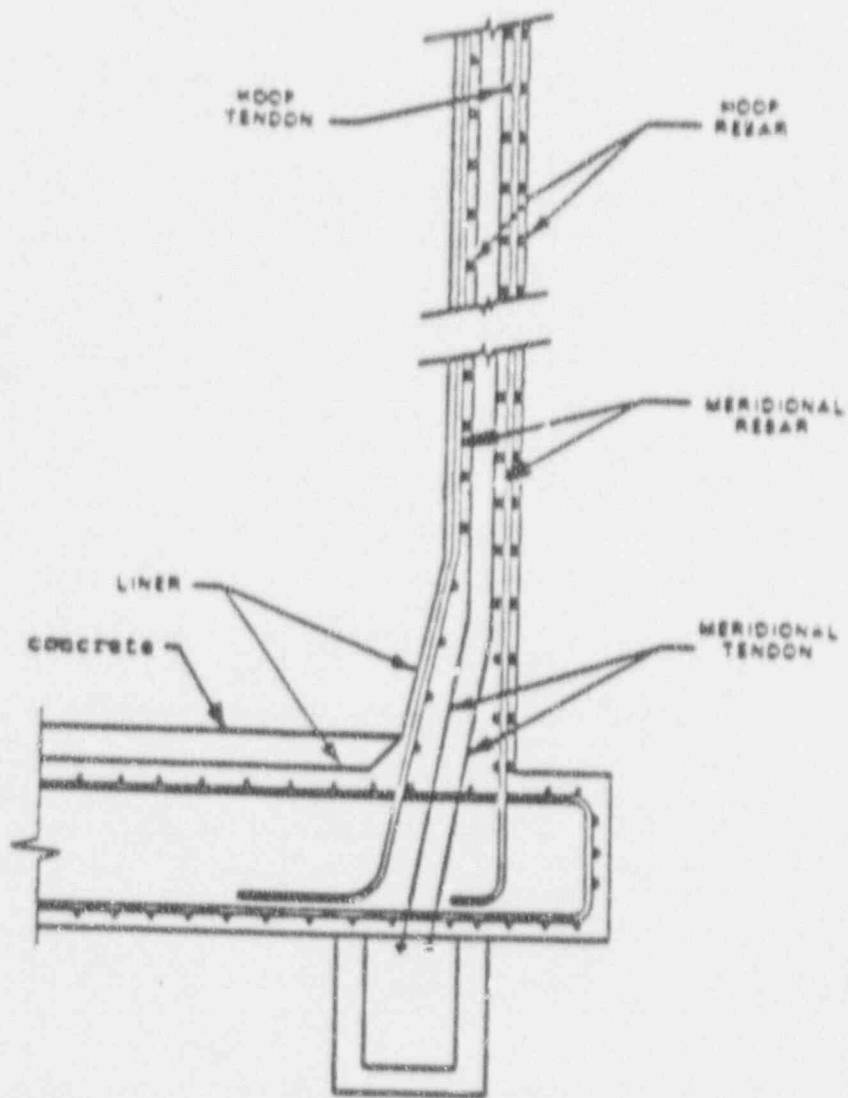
Wall Base Mat Junction of Prestressed Containment
